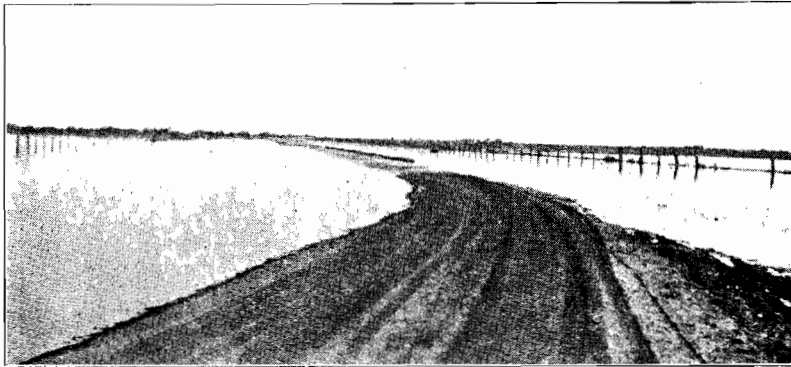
Showing floods on the Murray Valley Highway east of Nine Mile Creek.
